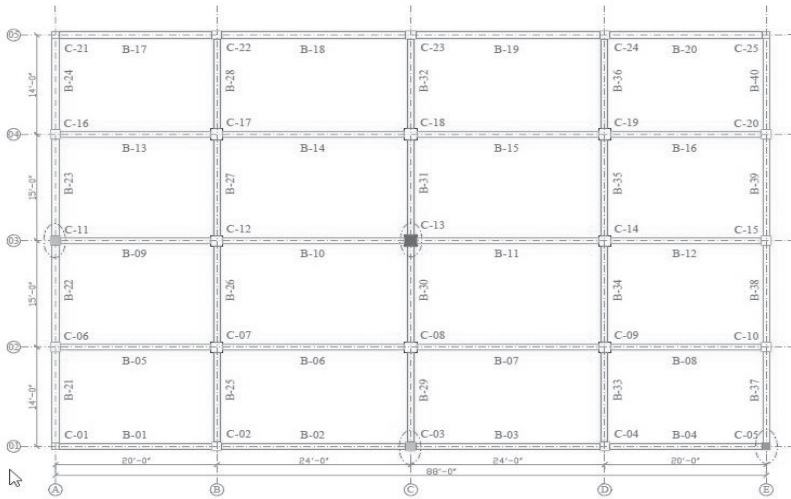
Column and beam layout and identification of column removal point of the framed and flat plate building structure.
